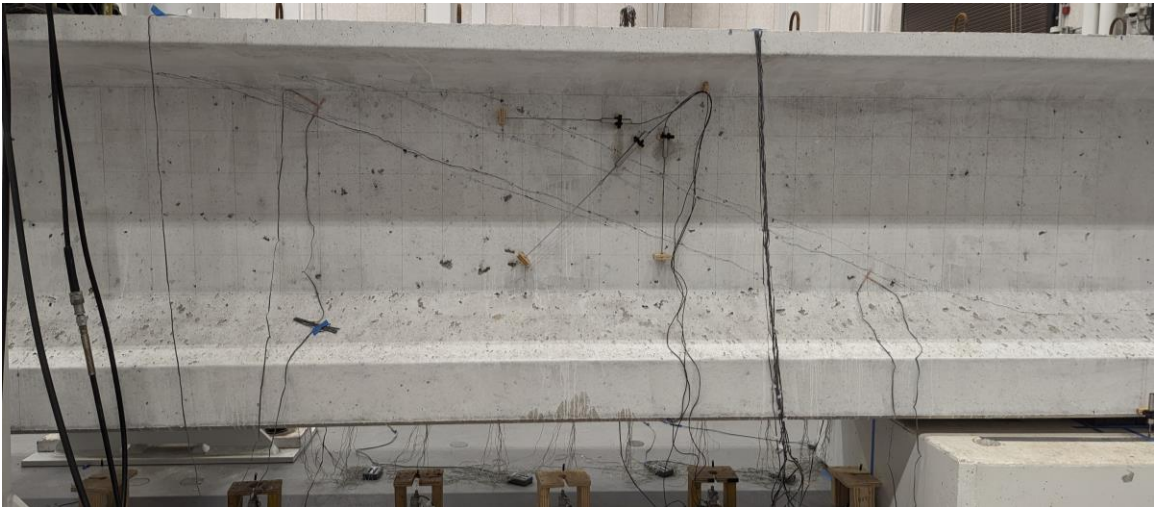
East side of G2 girder at cracking load.
